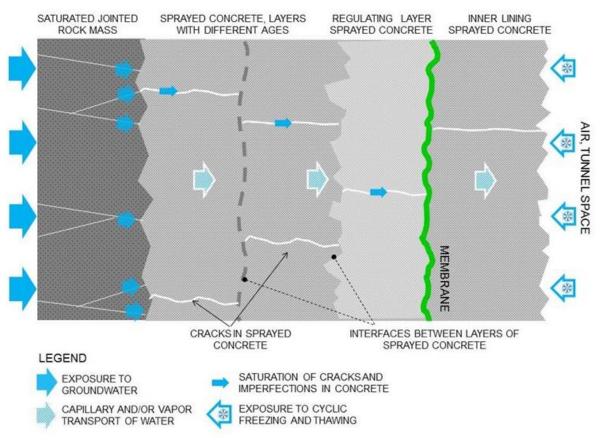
Cross section with details and waterproofing function for a tunnel lining with sprayed concrete in combination with a spray-applied membrane [1]
